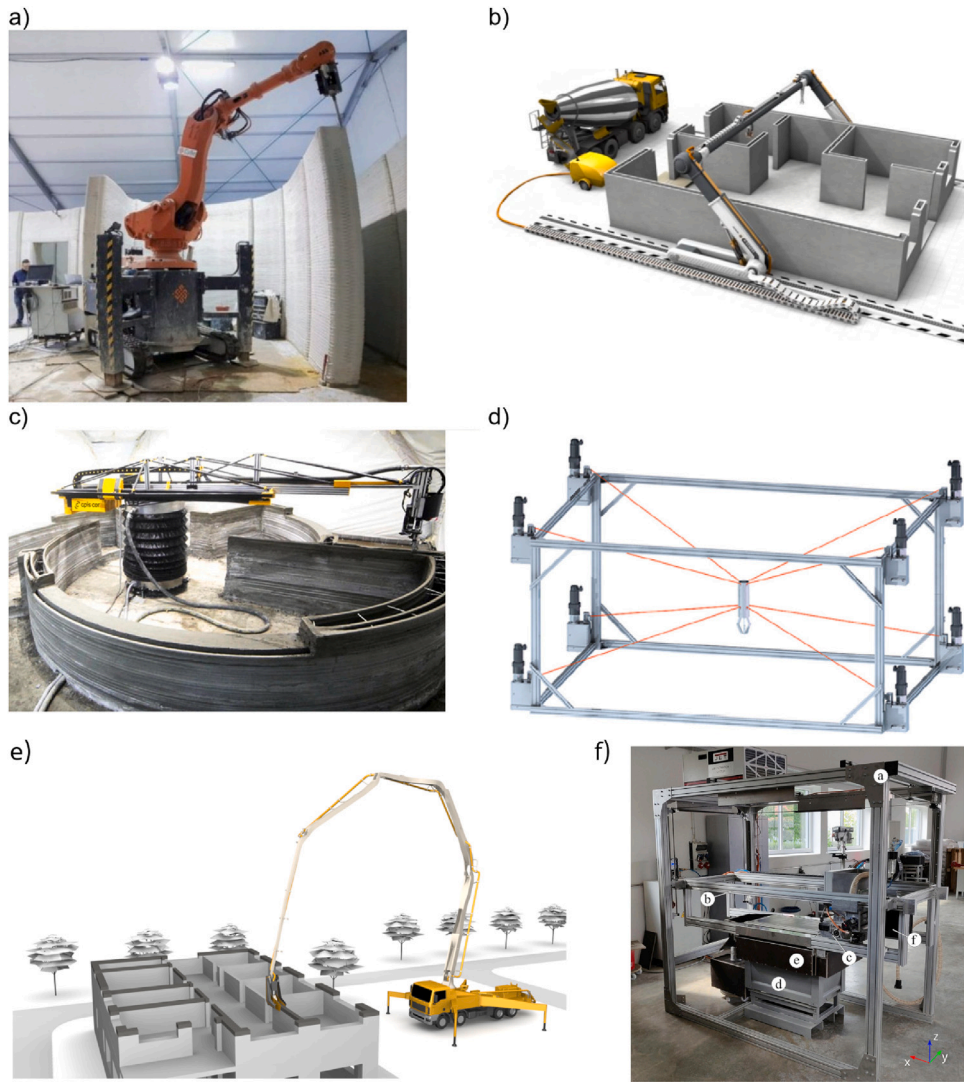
Different robotic manipulators utilized in AM methods for construction [18,22,30]. (a) to (e) illustrate robots that can be used in depositing methods, and (f) shows a lab-scale particle-bed printer. (a) shows a 6 DoF robotic arm manipulator, (b) a portal robot, (c) cylindrical robot, (d) cable-driven parallel robot, and (e) a modified boom pump.
